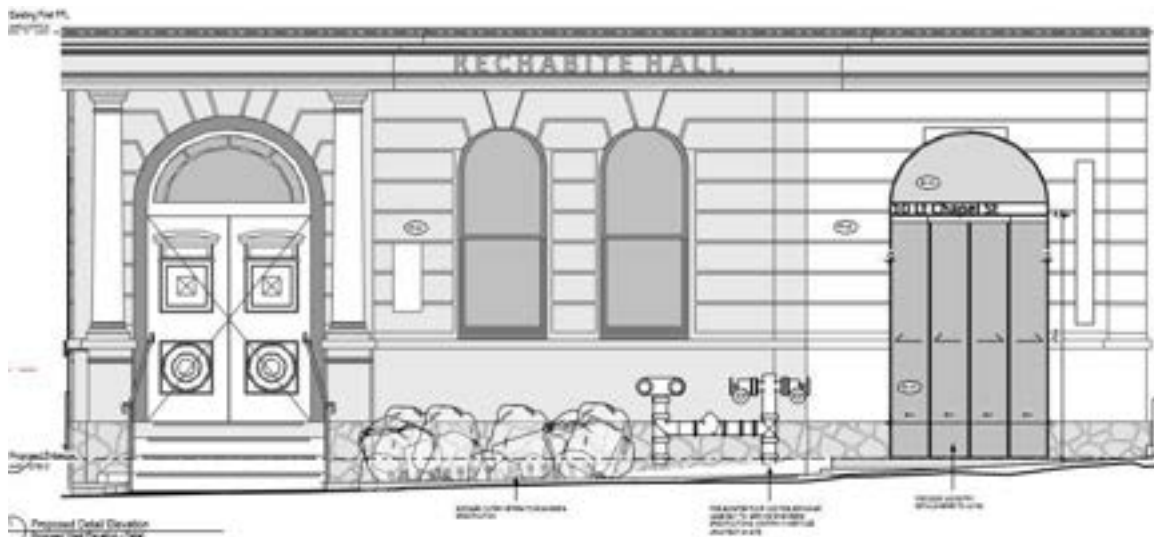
A3-510 Proposed detailed west (front) elevation, showing the original and new entrances. Source: Trethowan Architecture, 2025.
